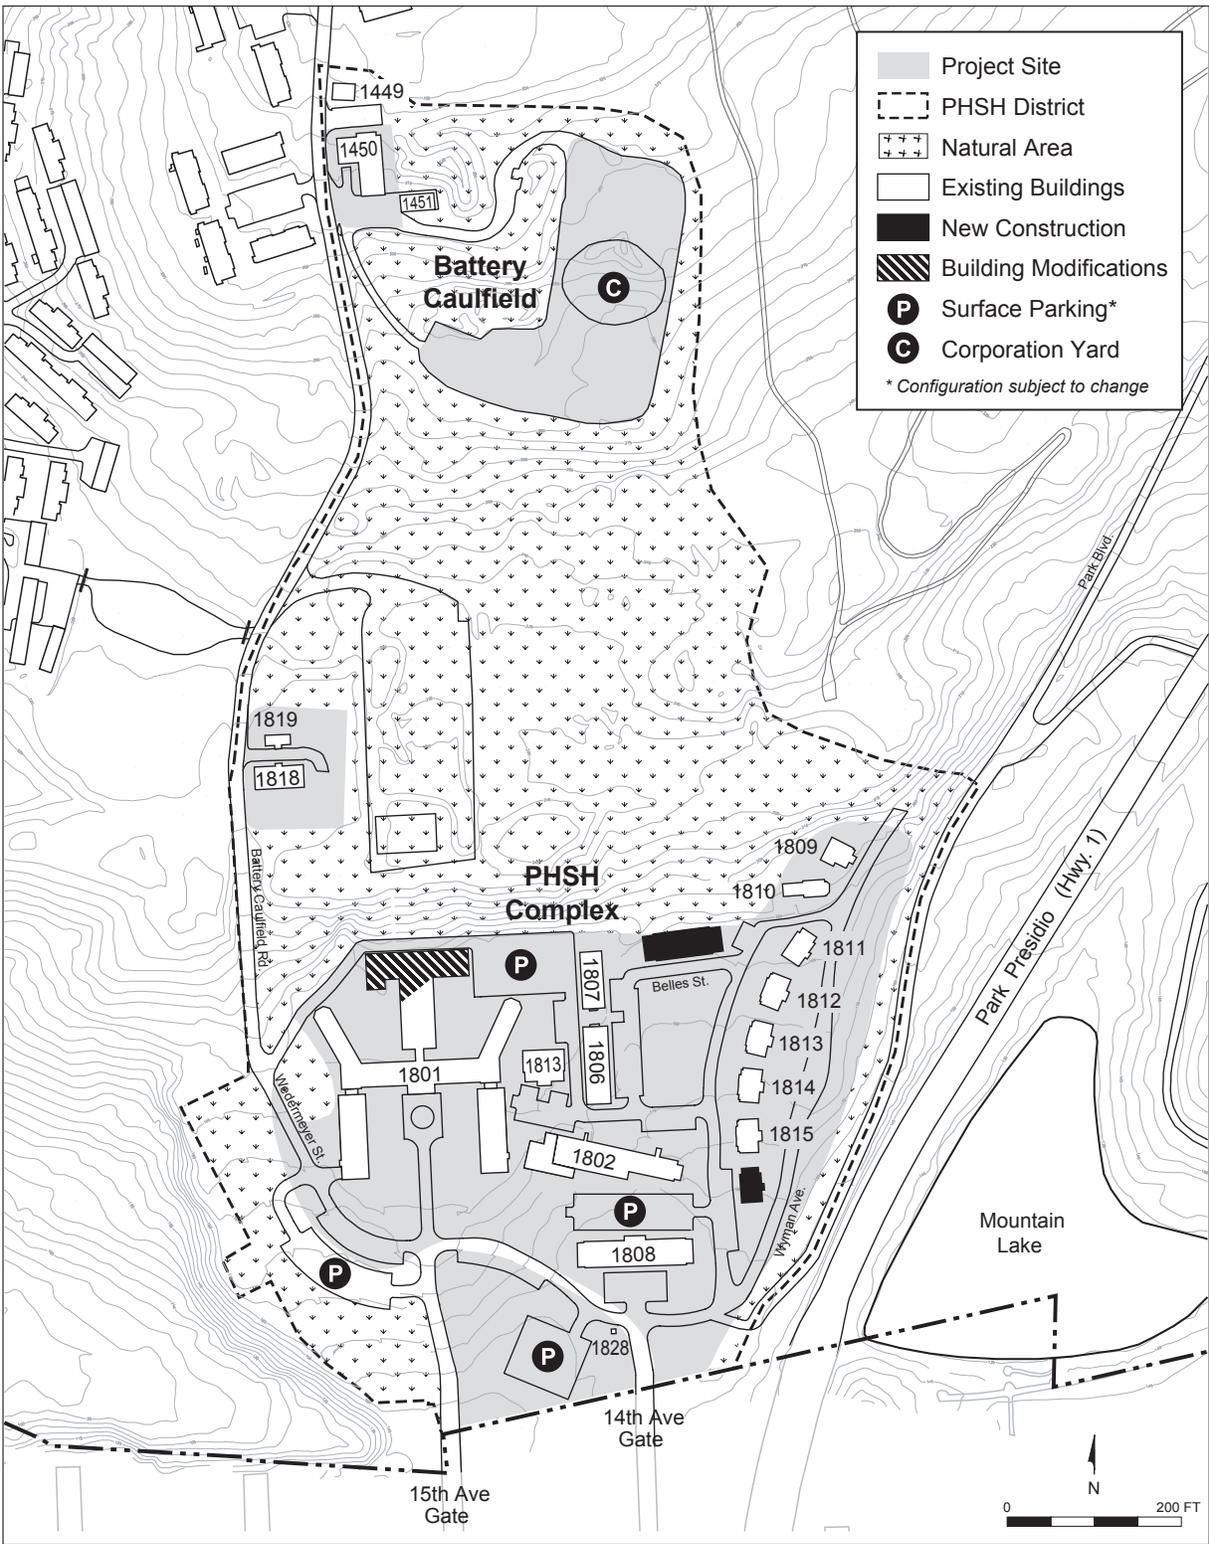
ALTERNATIVE 2: INFILL ALTERNATIVE
